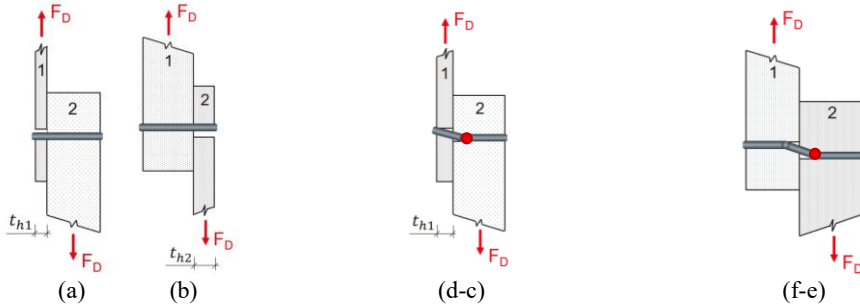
Failure modes of improved analytical model for timber-steel connections
